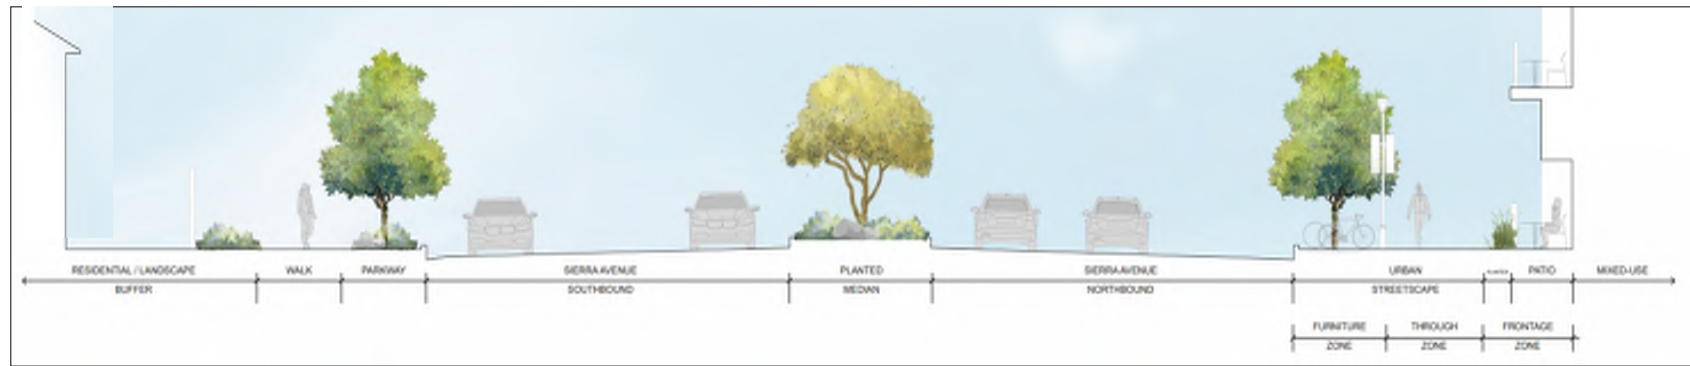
Conceptual Site Elevations – Gateway South Sub-District
